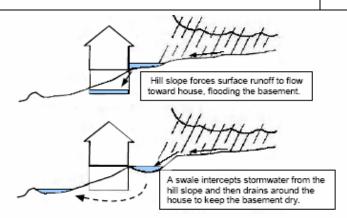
Correction of typical slope drainage problem using swale or ditch.
